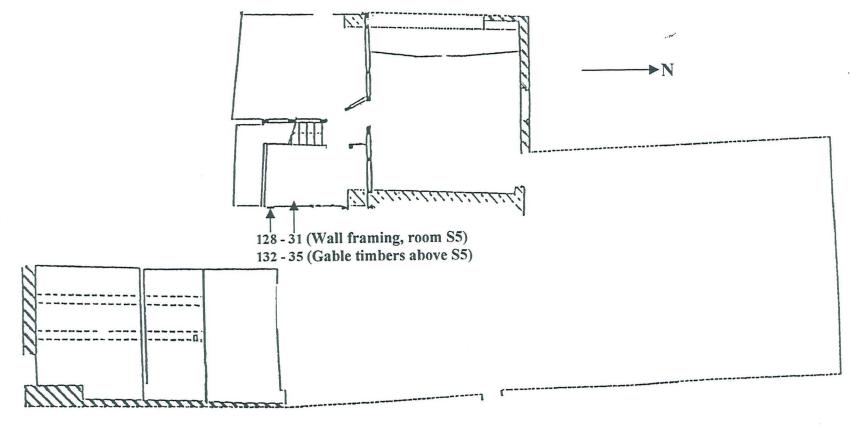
Drawing to show approximate location of sampled timbers from the second floor and roof
